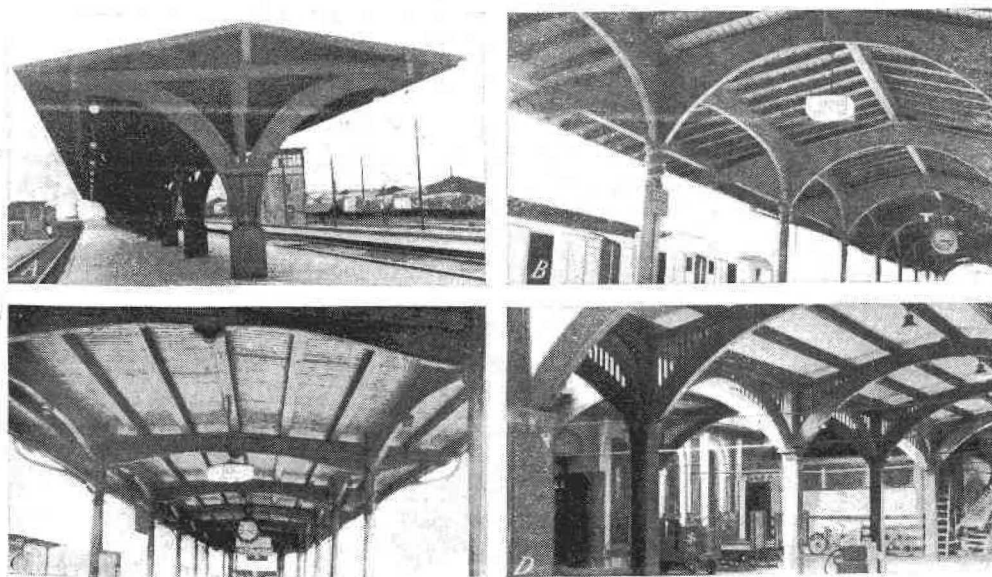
Examples of glued laminated construction in railway station platform roof supports: *A*, Curved braces, Trondhjem, Norway; *B*, false arches, Landquart, Switzerland; *C*, curved beams, Gossau, Switzerland; *D*, arches, Gothenburg, Sweden.
